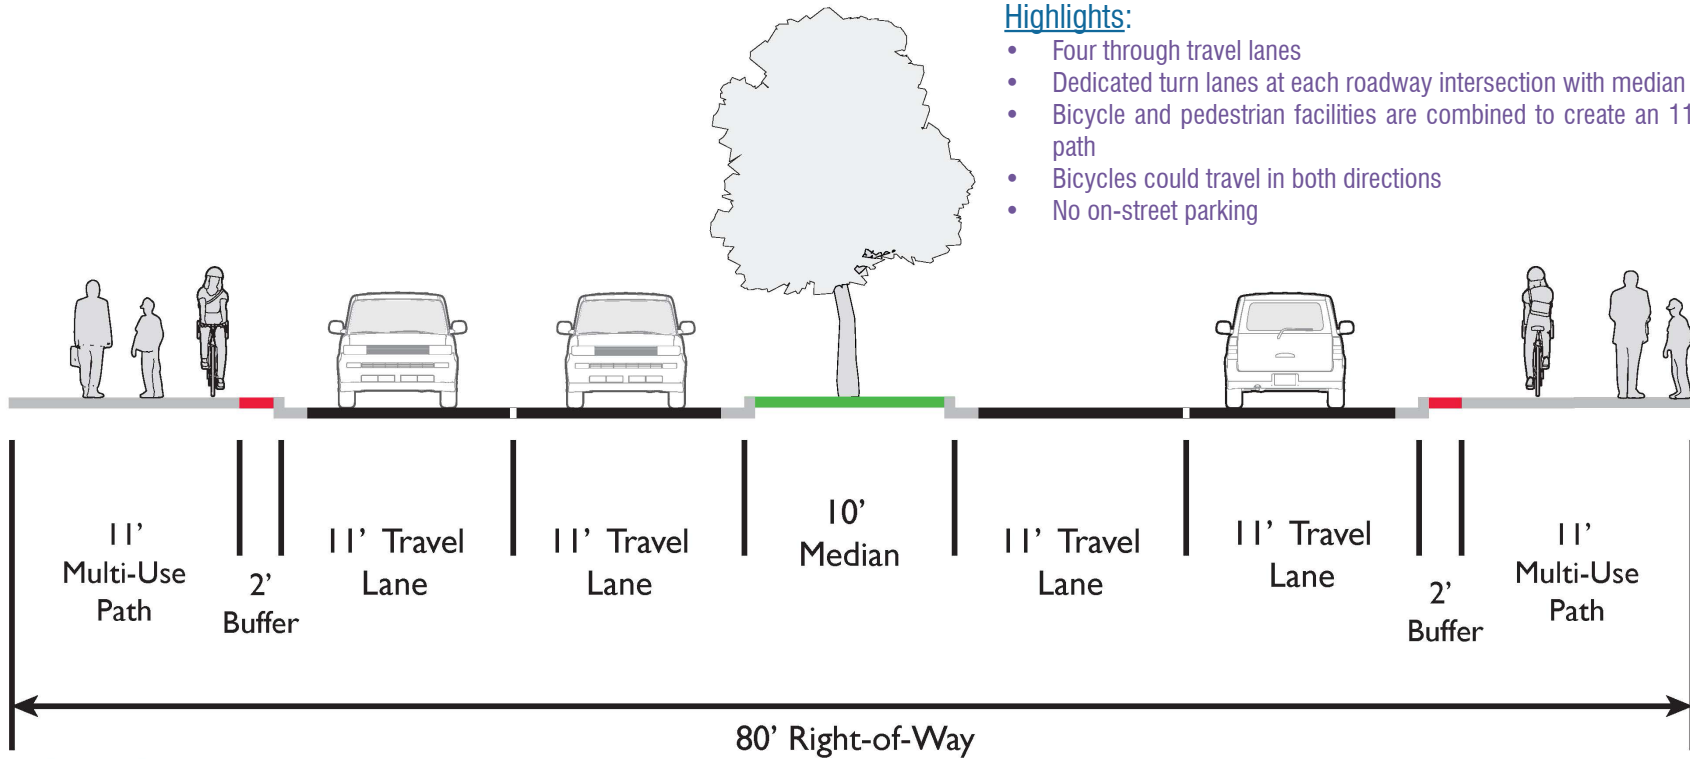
West Residential Zone Mixed Bike and Pedestrian - Section
